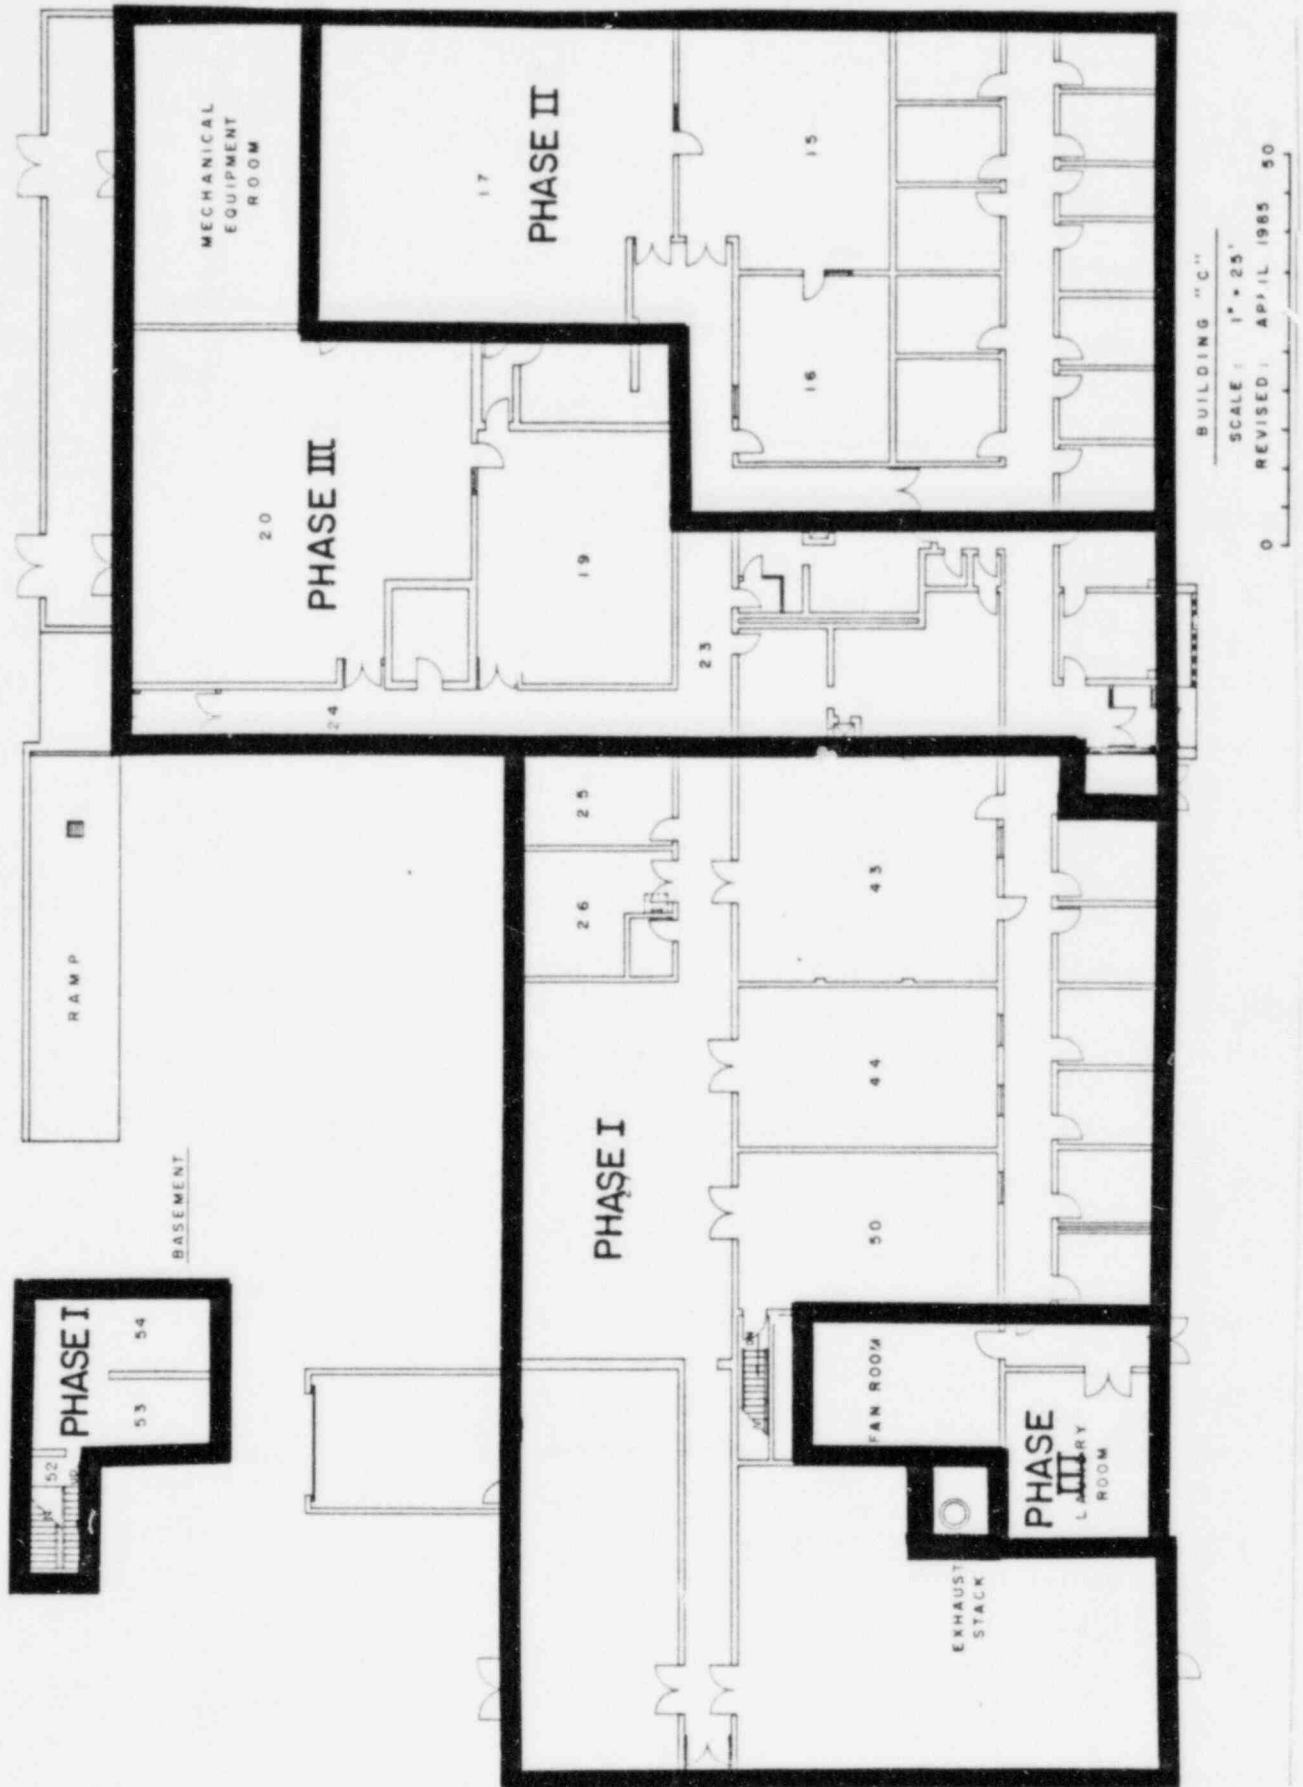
BUILDING C - FLOOR PLAN WITH PHASE BOUNDARIES
